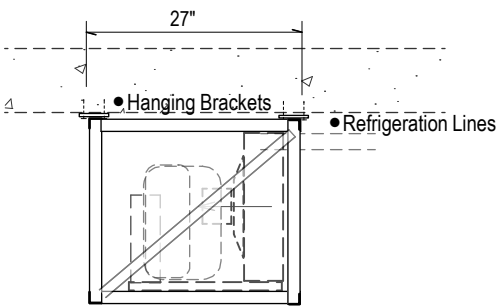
DETAIL DRAWING			Addendum #4	D.D.No:	Item: Compressor Rack	No: 7
